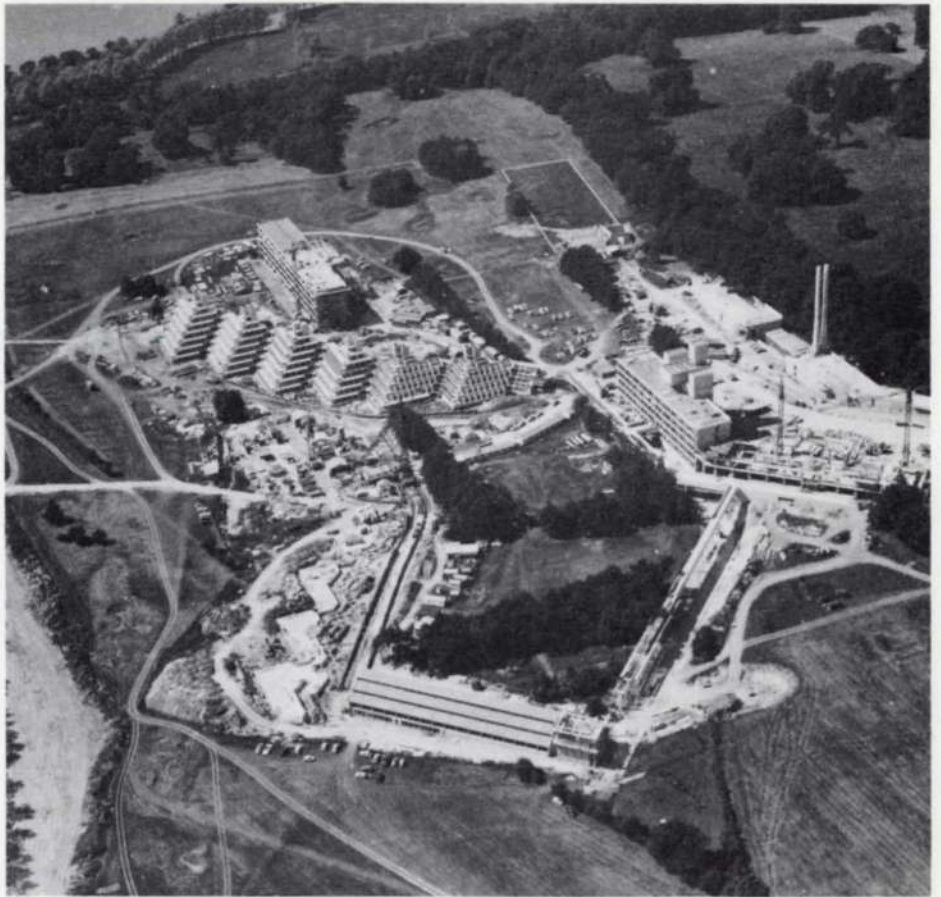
Aerial view of residences under construction. (Photo: Aerofilms Ltd).
